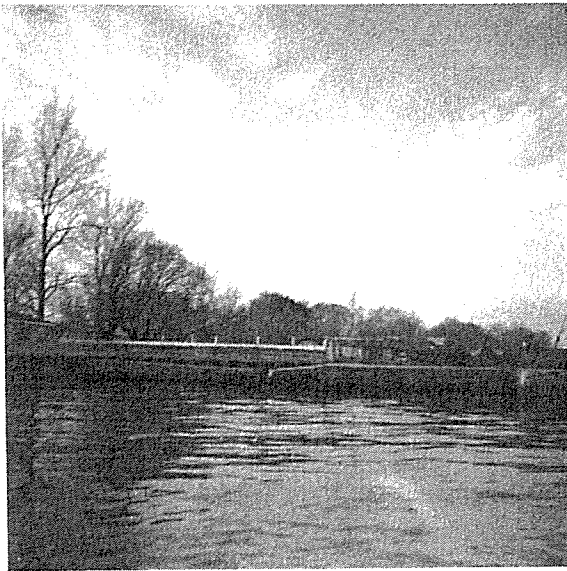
View from channel of section of pier from Sta. 7+90 to 8+90, showing the inner end of the 20-foot wide portion, the 9-foot wide portion, and the 5-foot wide portion.
